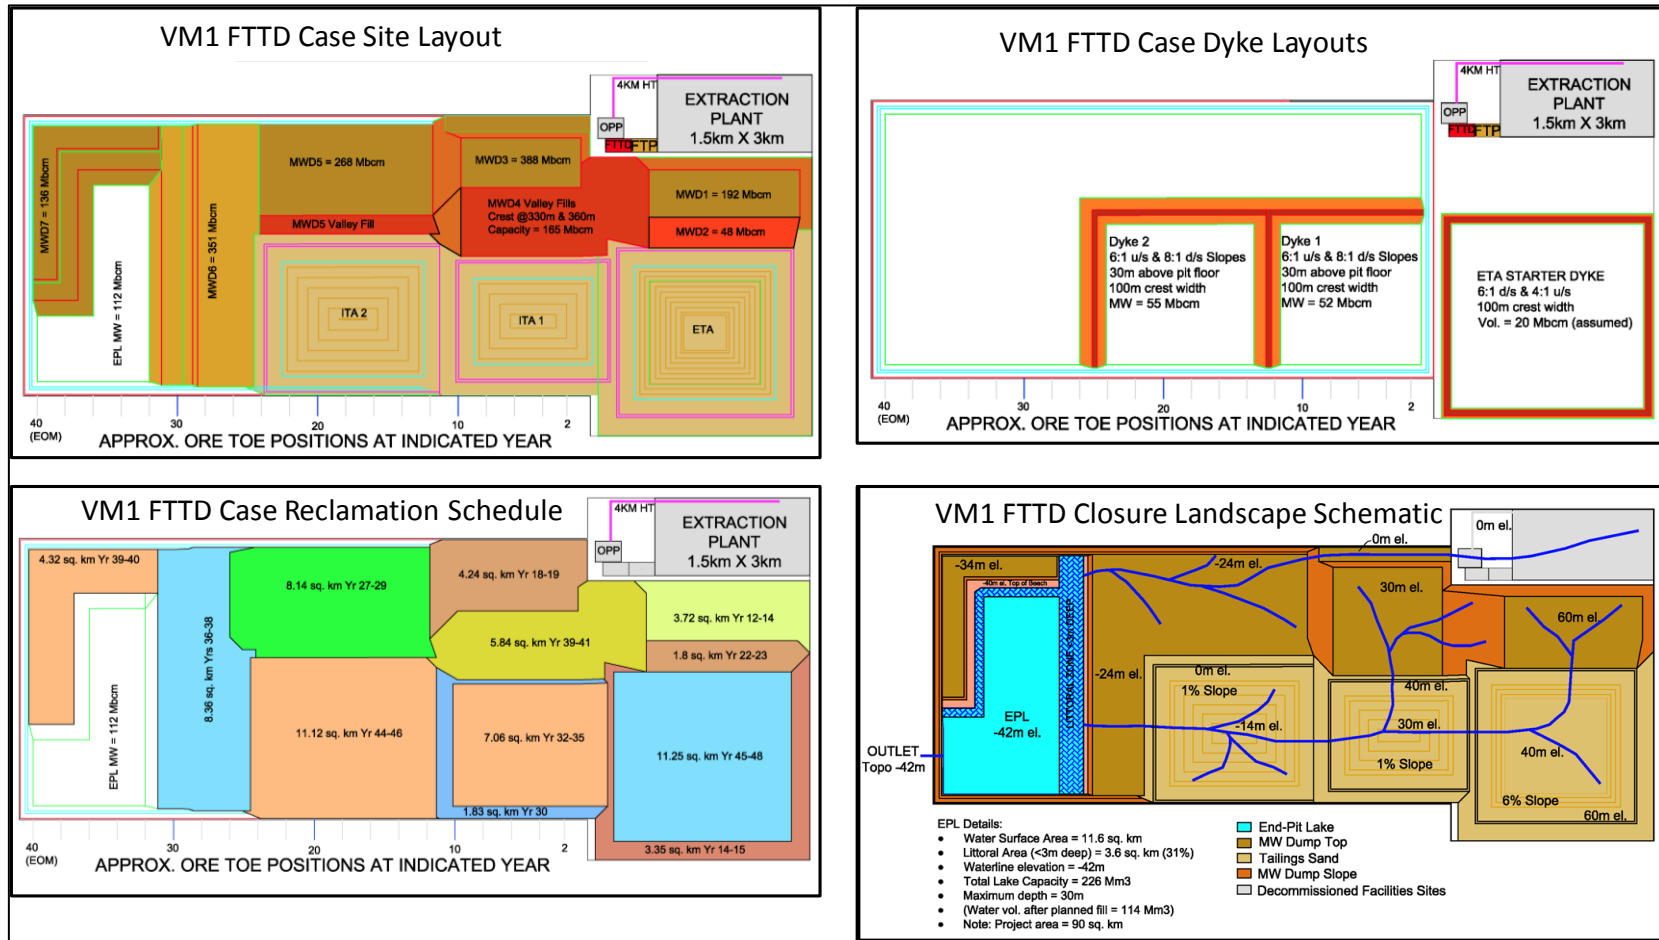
Site Layout and Progression to Closure for VM1 Thermal Drying Case
